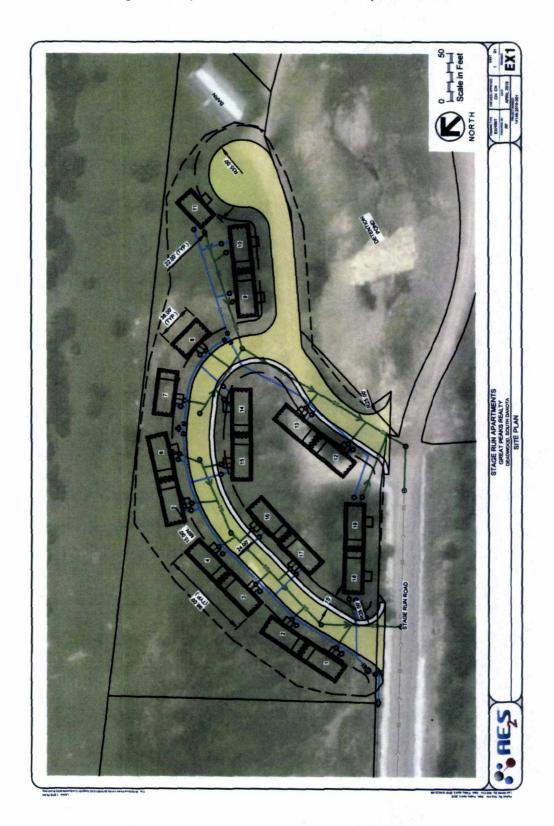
Stage Run Apartment Site Plan and Improvements
